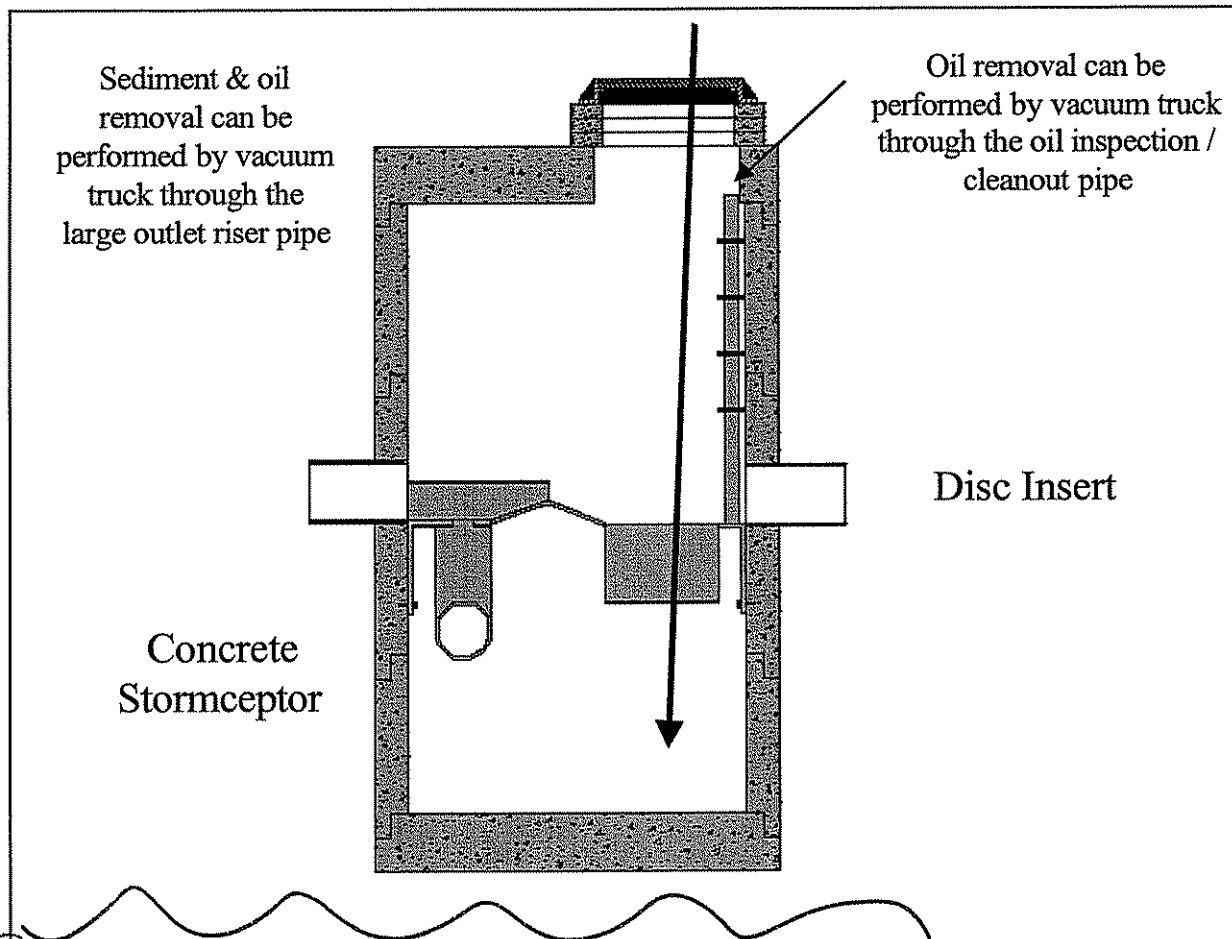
Single Inlet/Outlet "Disc" Insert Concrete Stormceptor®
